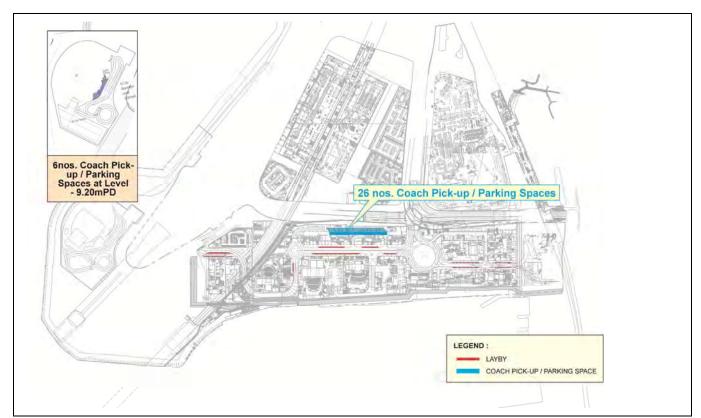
Level +9.35mPD Layout Plan – Pick-up/Drop-off Laybys
